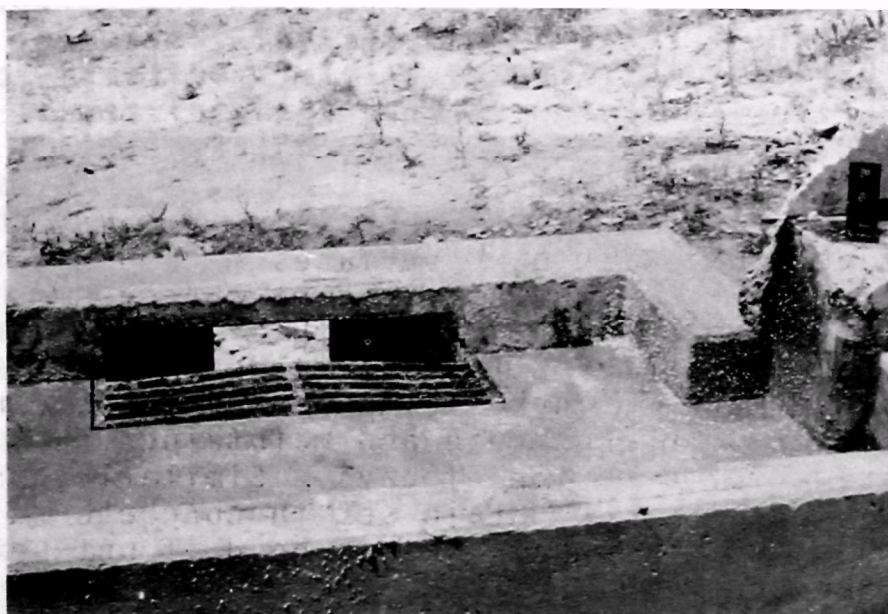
CONCRETE PAD WITH CURB DRAIN
